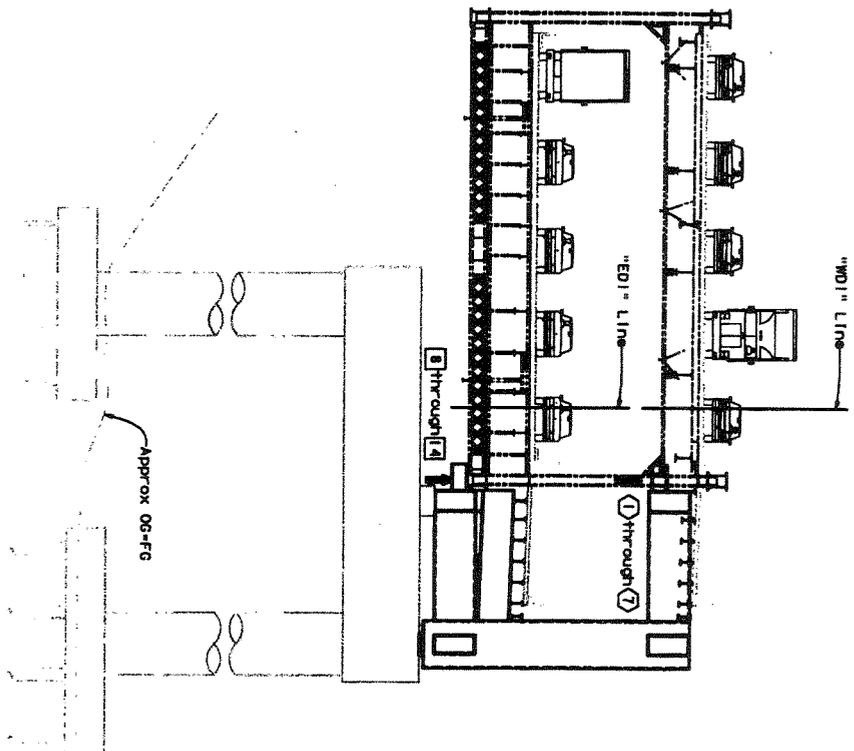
Stage 1 – Construction of South Segment Prior to Connection
